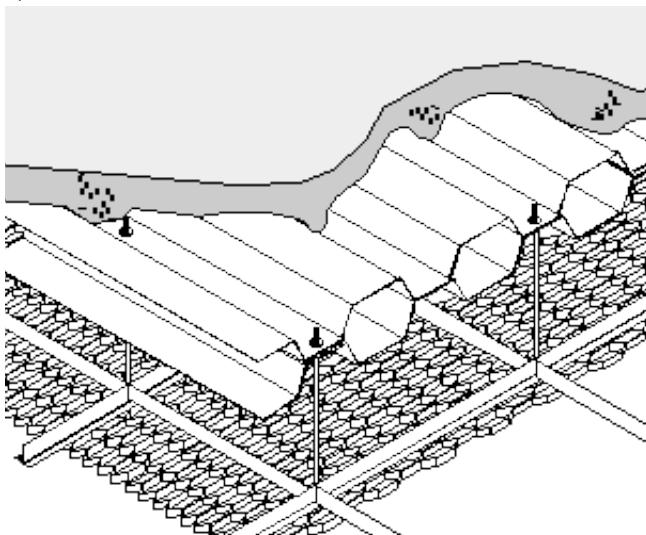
Floors cast onto permanent shuttering have only one face from which the concrete can dry
